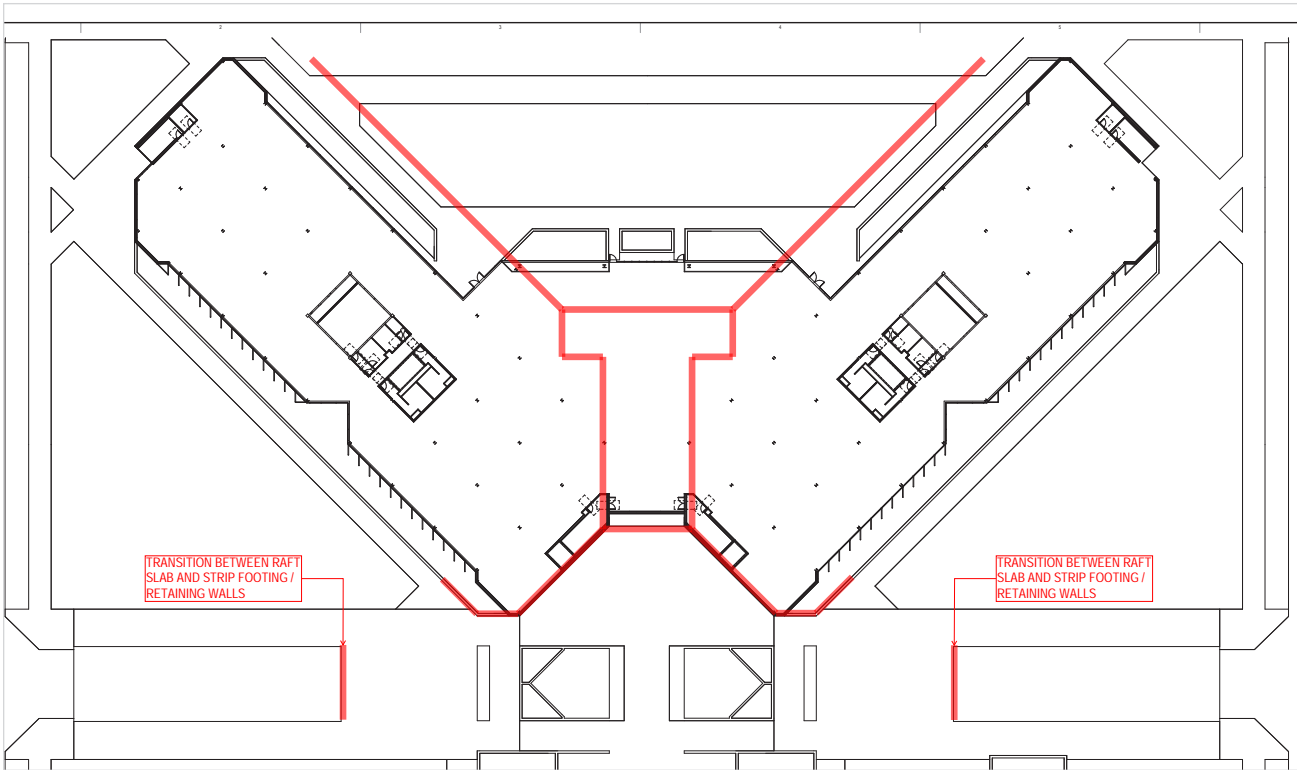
First floor expansion joint locations overlaid on first floor/plaza level (shown in red).
